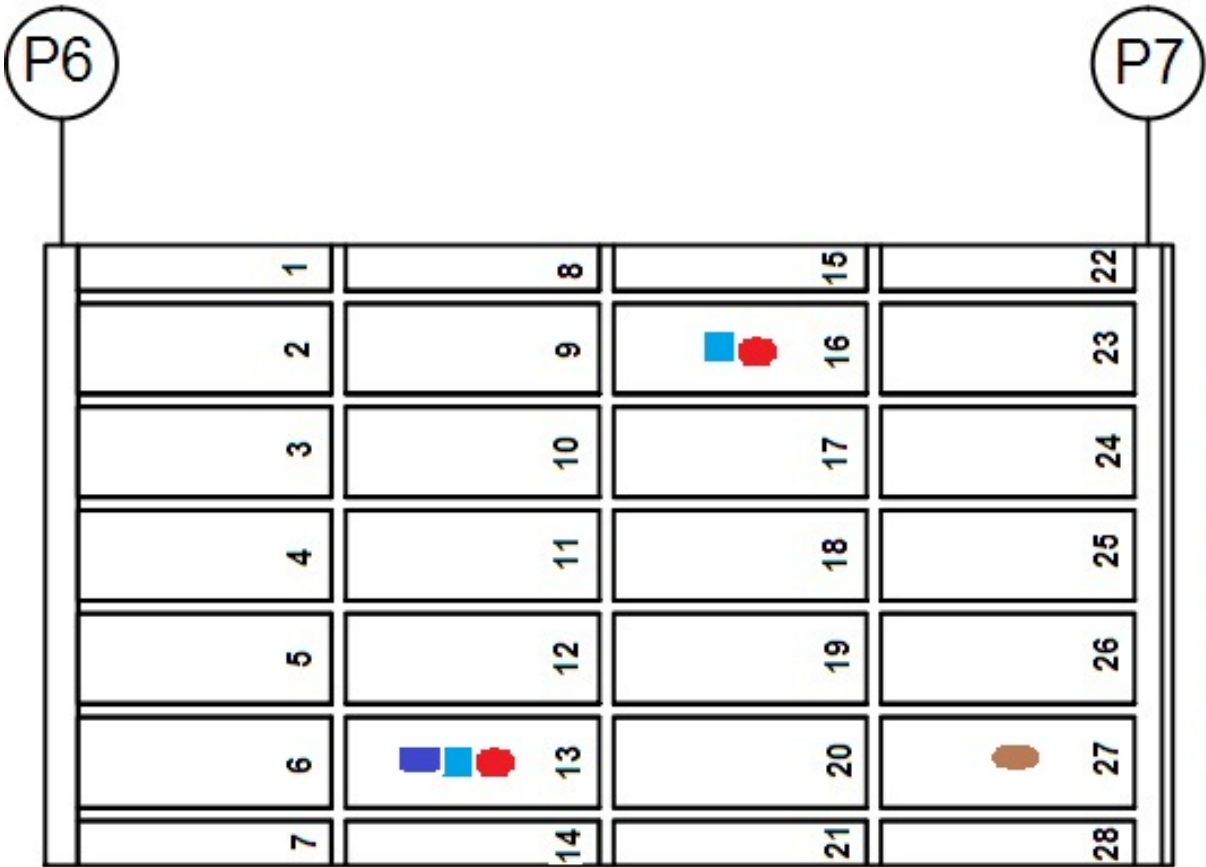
Test conducted at various locations between Pier P6 and Pier P7
